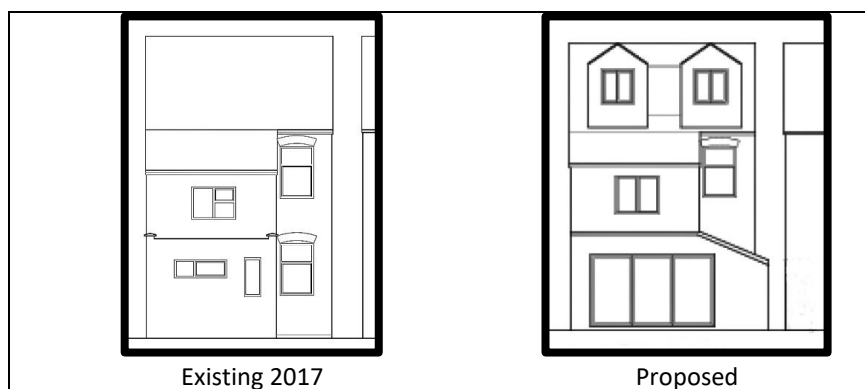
No. 2 Madras Road rear elevation in 2017 (existing and 2017 (proposed) (CCPD)
